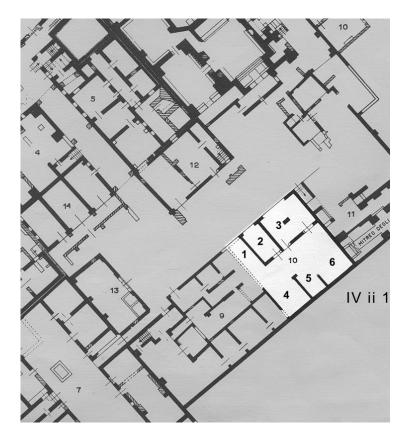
Plan of building IV, ii, 10 (SO 1, Pl. 13)
